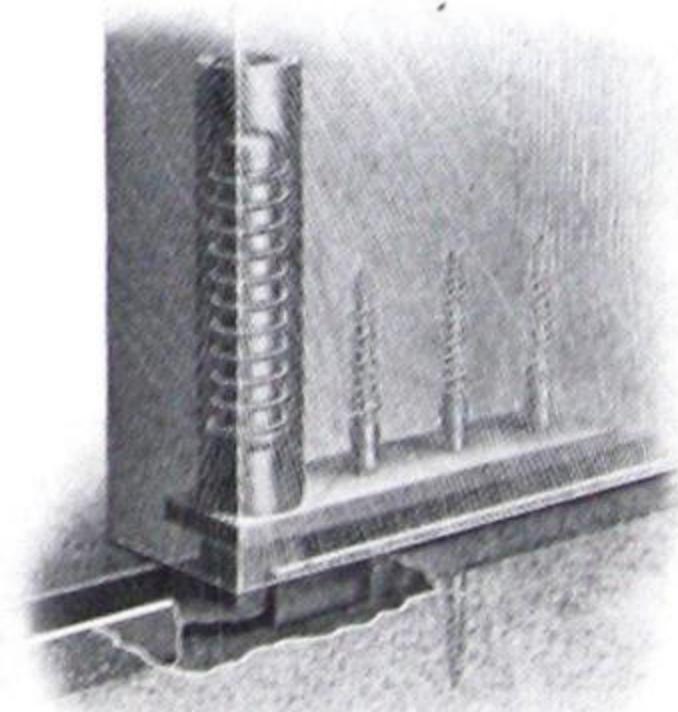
Showing No. 635 F. G. Floor Guide and Floor Guide Track.
